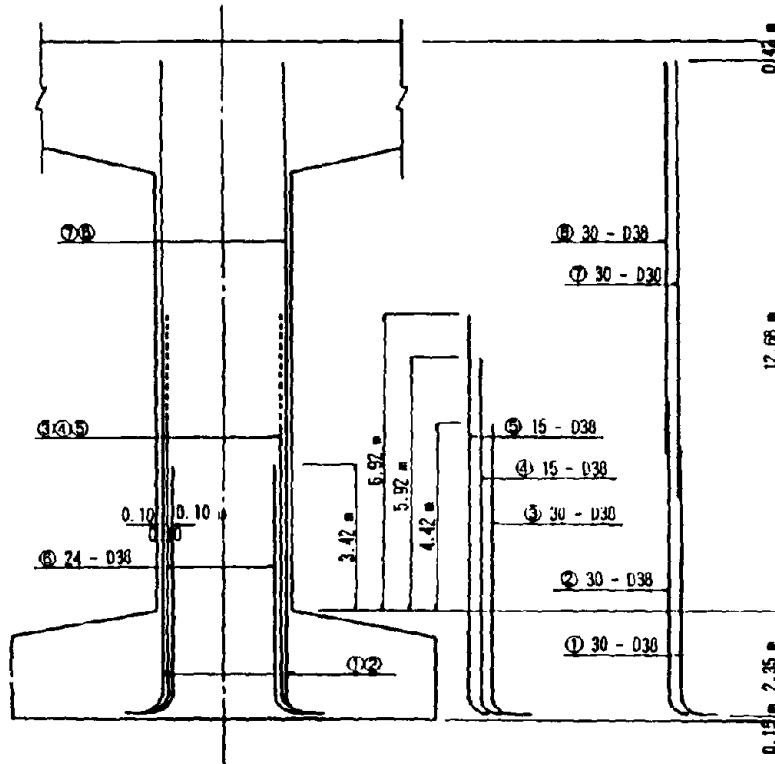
Arrangement of Main Reinforcement of Case A Model Pier Column
